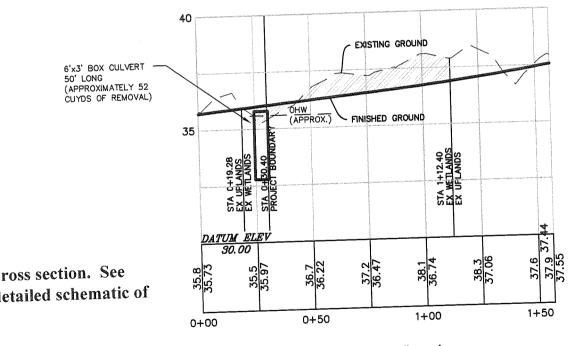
Cross section. See figure 8 for detailed schematic of culvert.
